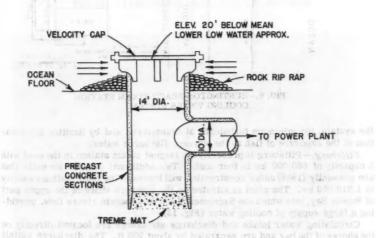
REDONDO STEAM STATION SUBMARINE CONDUIT
